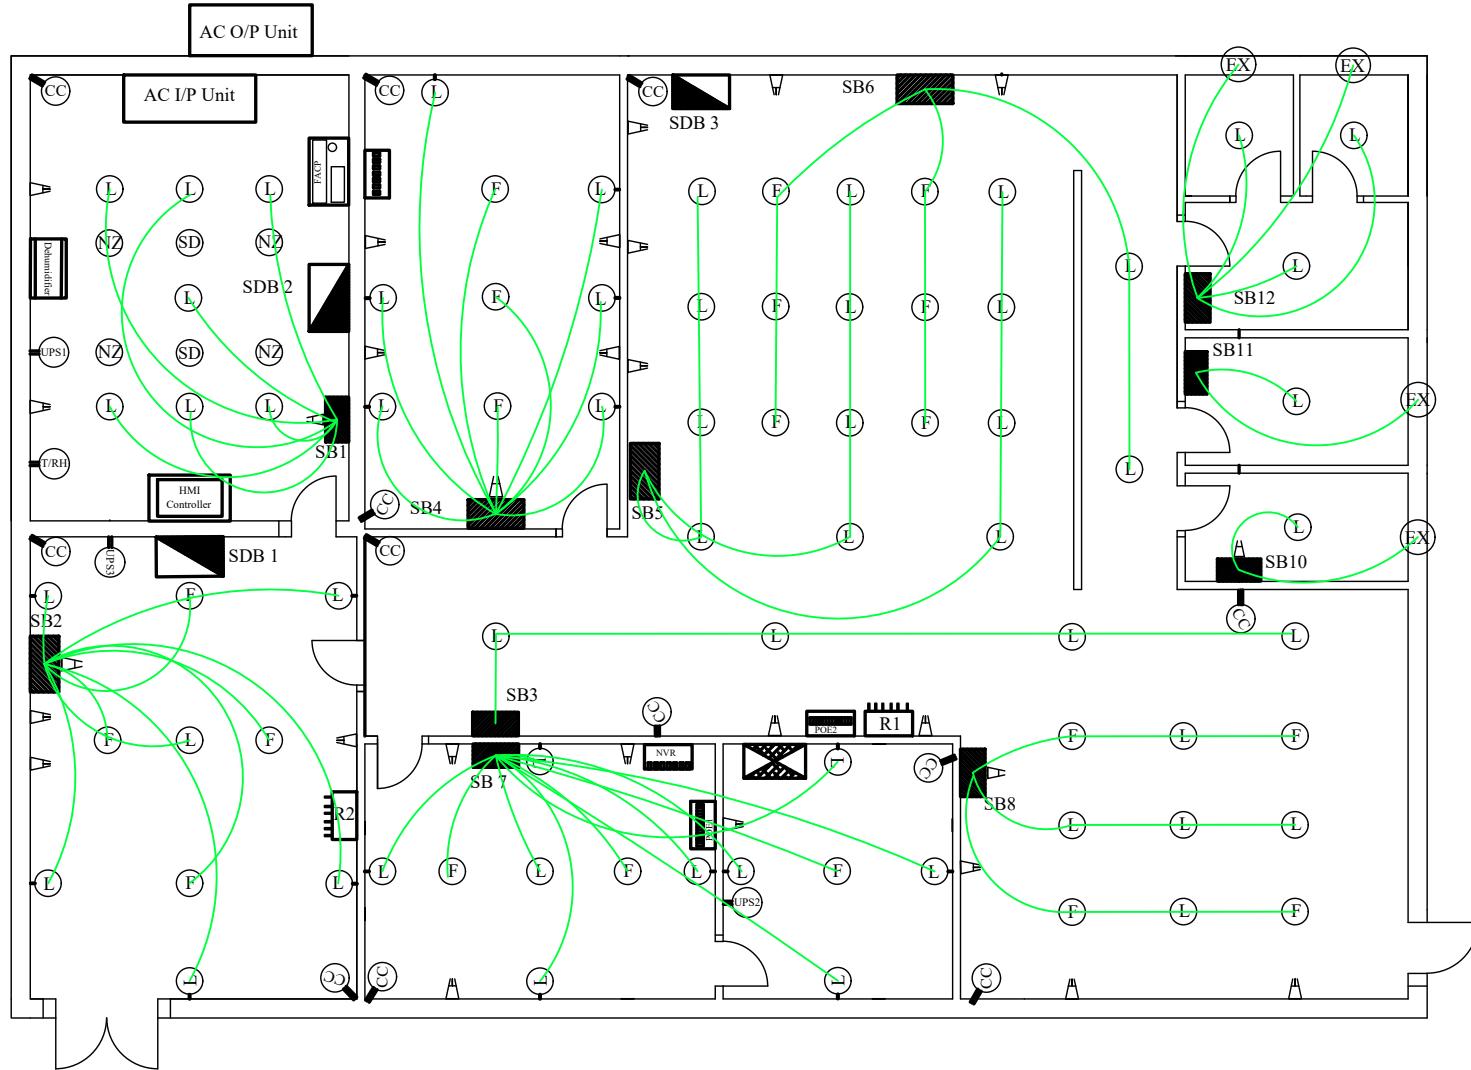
Conduit Layout: Final Circuits (Switchboards to Lights/Fans).
